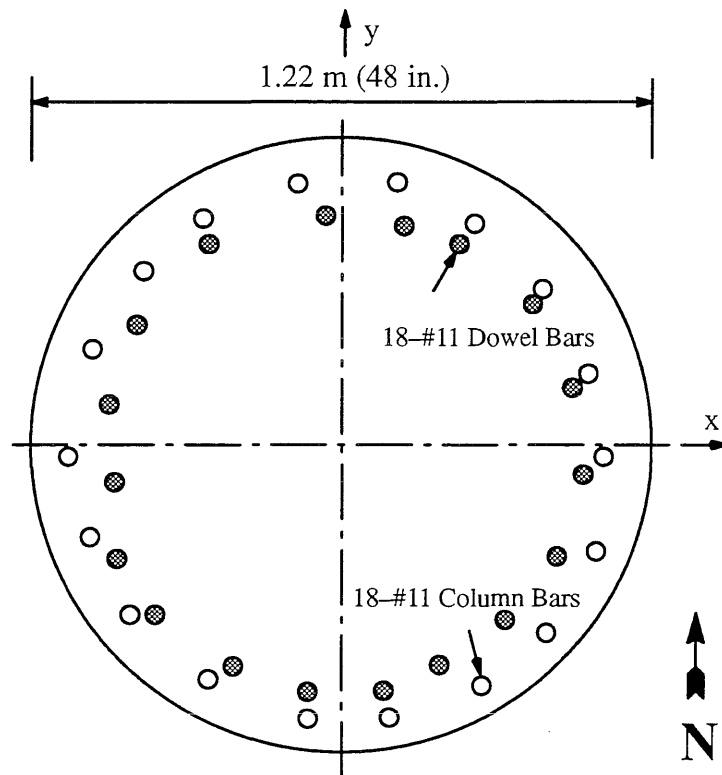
Bar Locations in 1.22 m (48 in.) Diameter Column B14S
